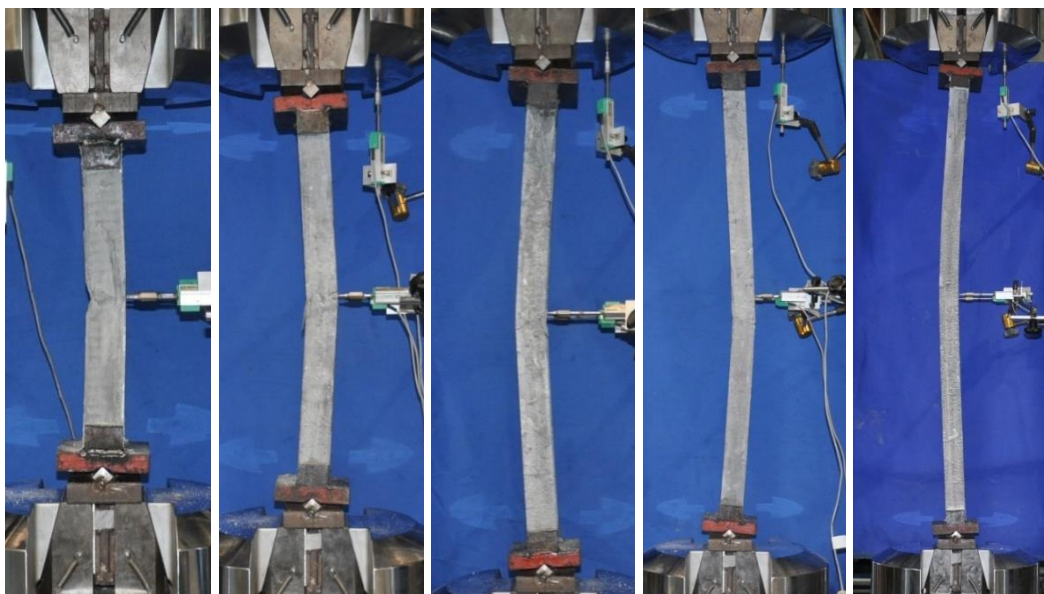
Overview failure of columns: (a) PI.40.02; (b) PI.60.02; (c) PI.80.01; (d) PI.100.01; (e) PI.120.02.
